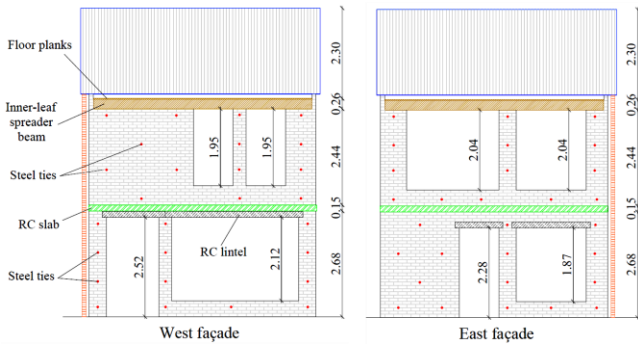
Calcium silicate longitudinal walls: elevations from outside. Units of m.
